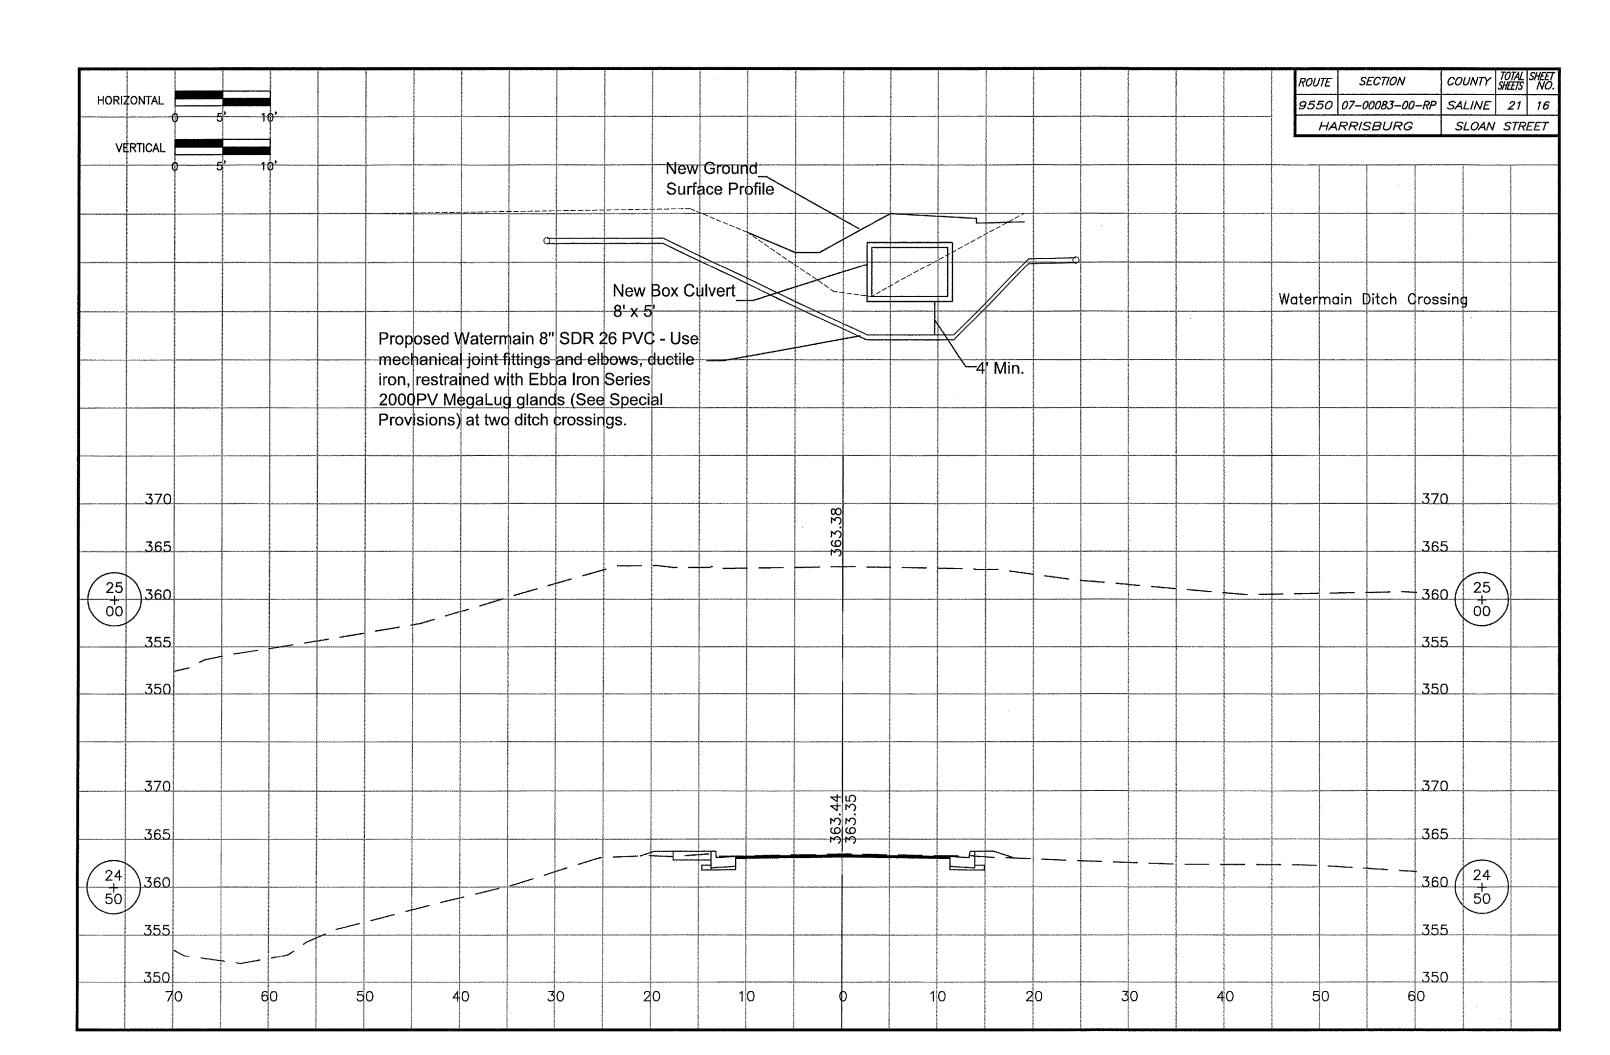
#### DETAIL OF PRECAST CONCRETE BOX CULVERT SECTION
